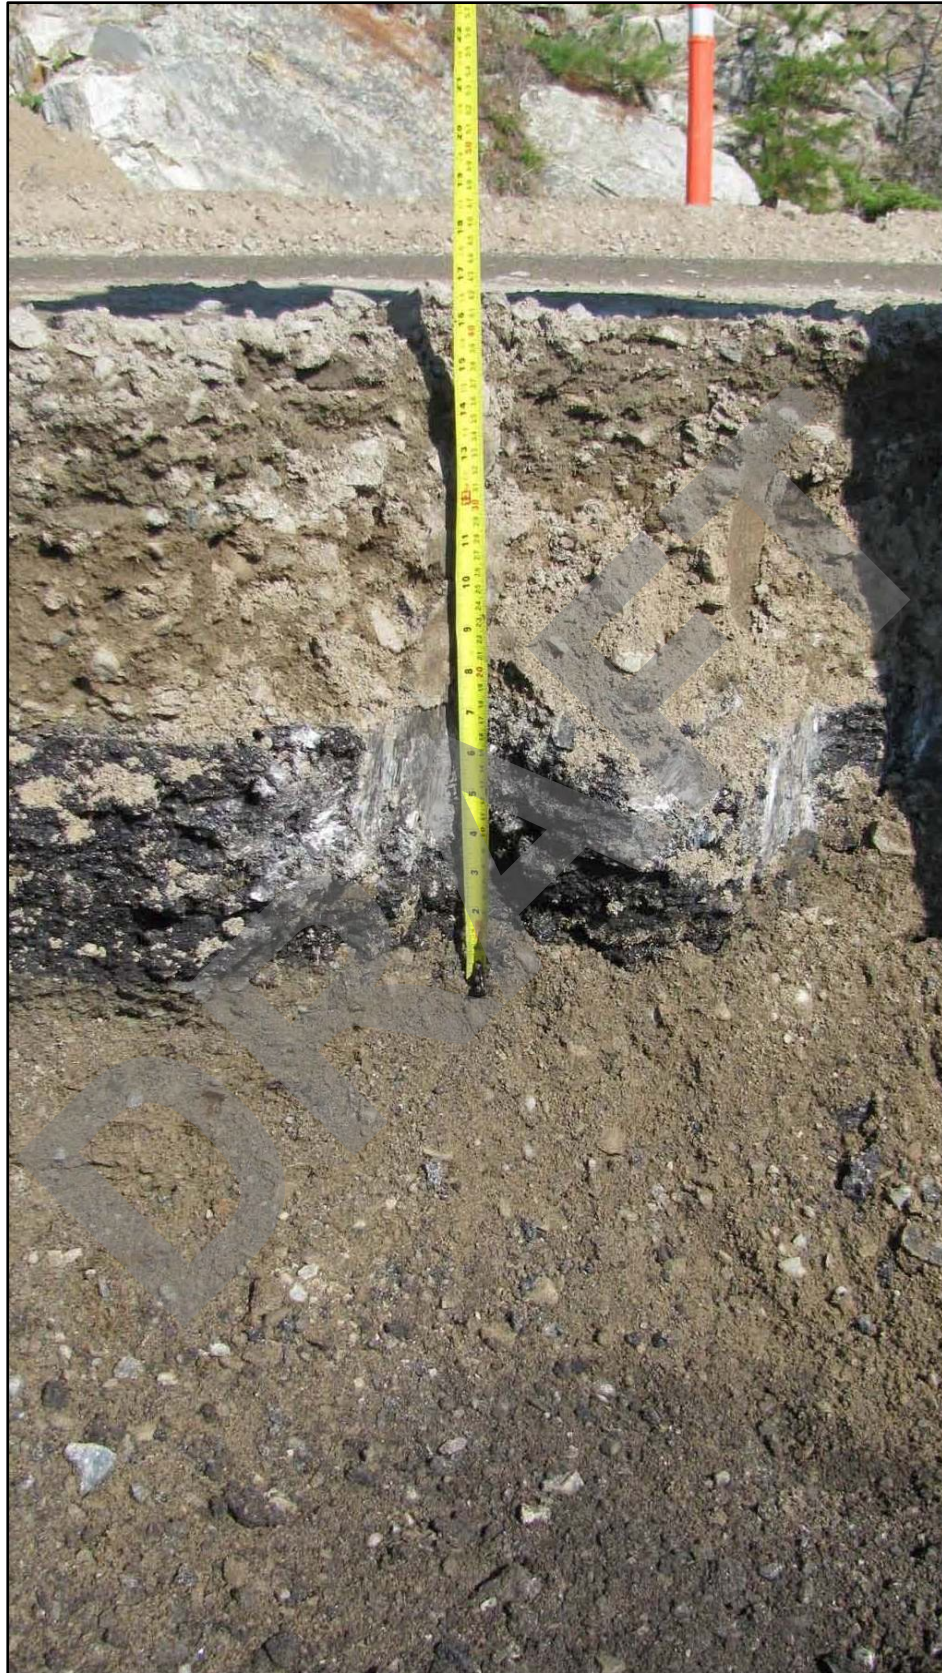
Pavement repair – note eight inches (200 mm) of fill over previous asphalt pavement (June 2012 by MTO).
